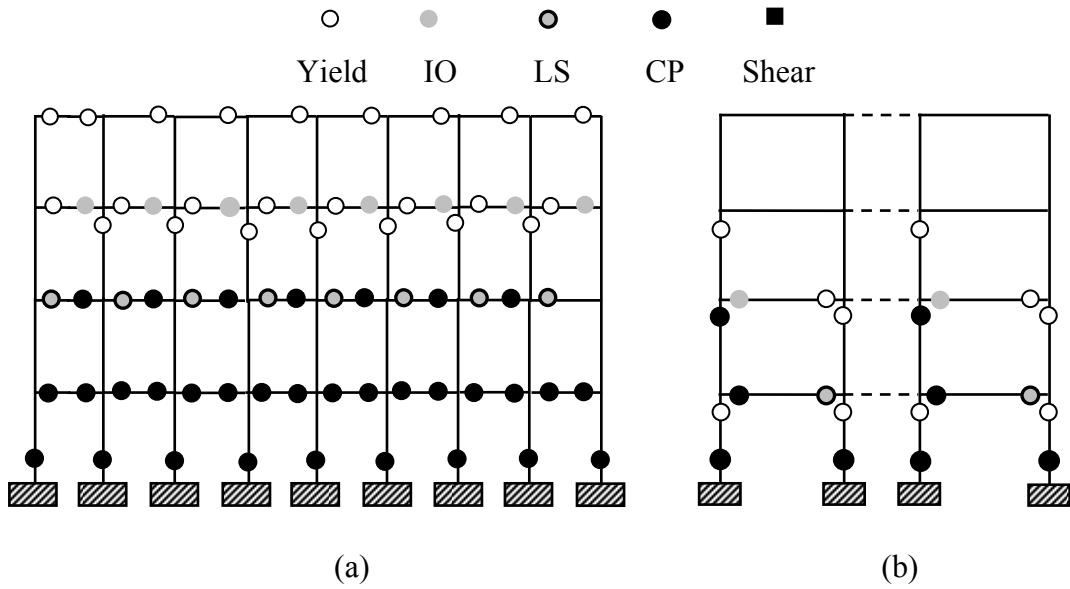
Collapse mechanism of four storey RC bare frame building, designed for gravity loads only as per relevant Indian Standards: (a) typical longitudinal frame; (b) typical transverse frame.
